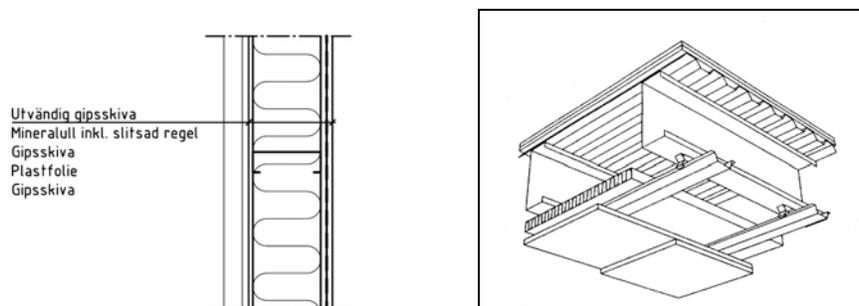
To the left: A wall with slotted light gauge steel studs. To the right: Construction principle for floors.
